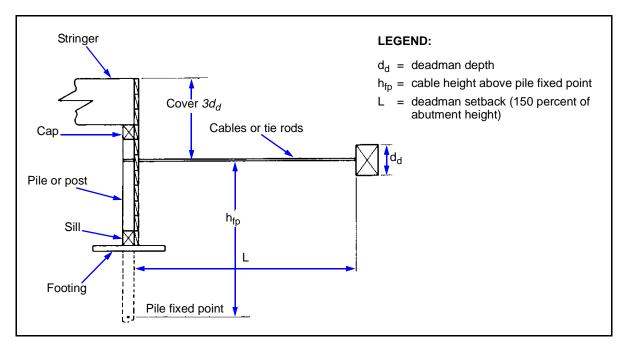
Deadman Installation on a Pile or Post Abutment
